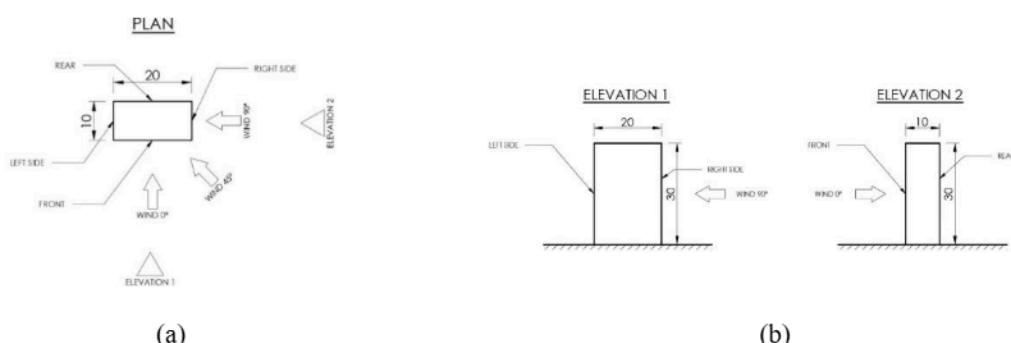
Building dimensions in (a) plan and (b) elevation. Units: meters
